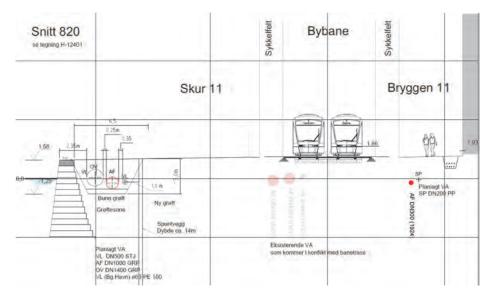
Situation at Finnegården with tracks and a pile wall © Bergen kommune
